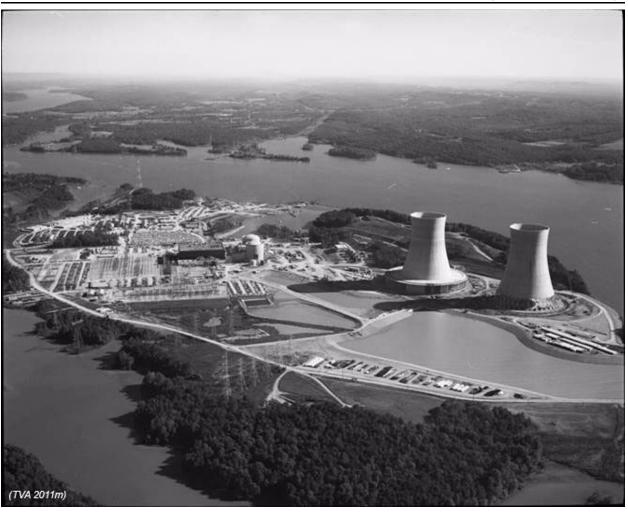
Oblique Aerial Photograph Taken During SQN Plant Construction
